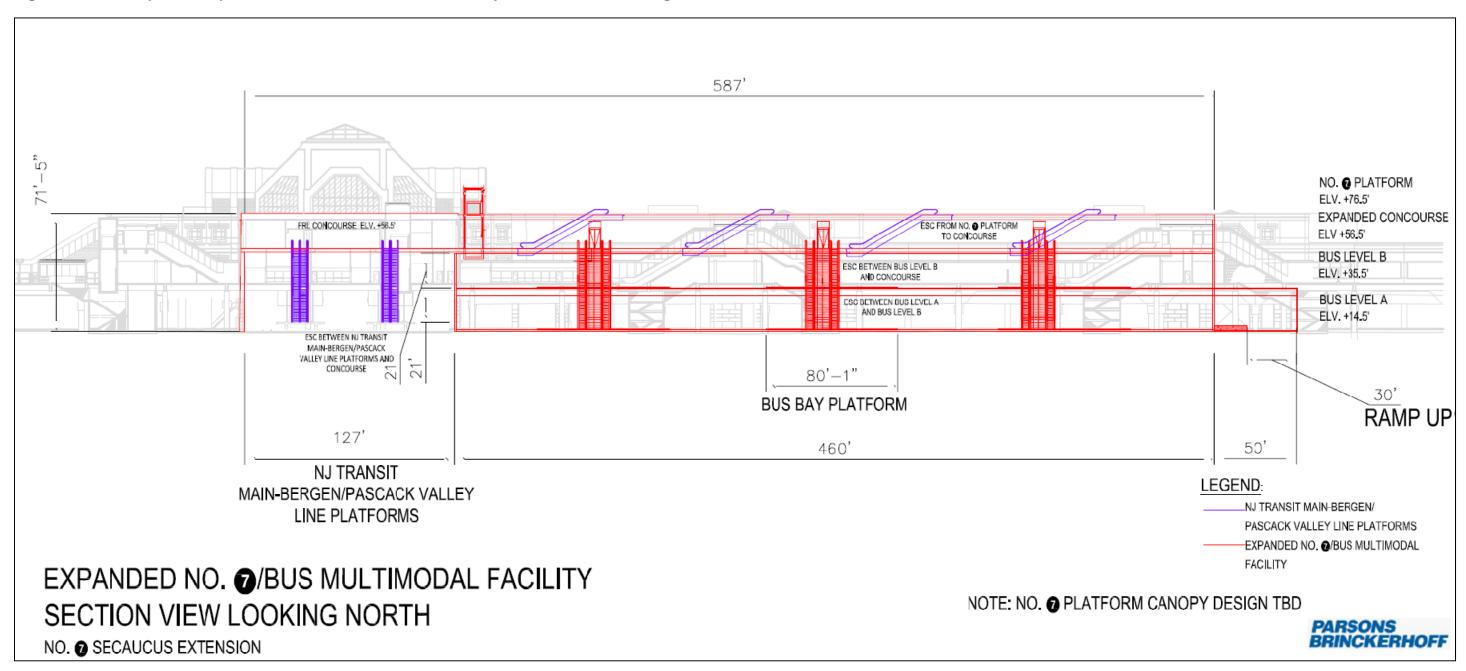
Proposed Expanded No. 7/Bus Multimodal Facility Section View Looking East at NJ TRANSIT Main-Bergen/Pascack Valley Line Platforms
